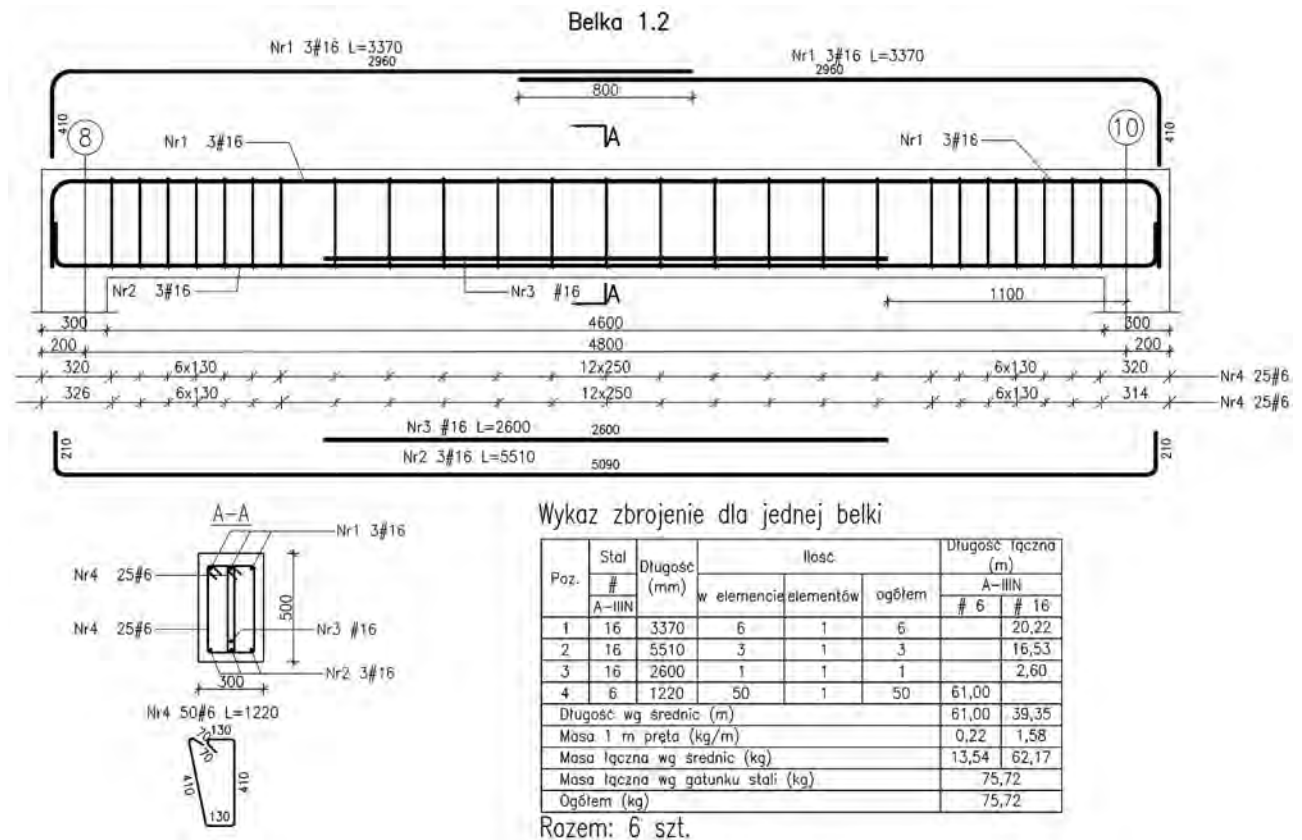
Executive-workshop drawing of the reinforced concrete beam [8]
